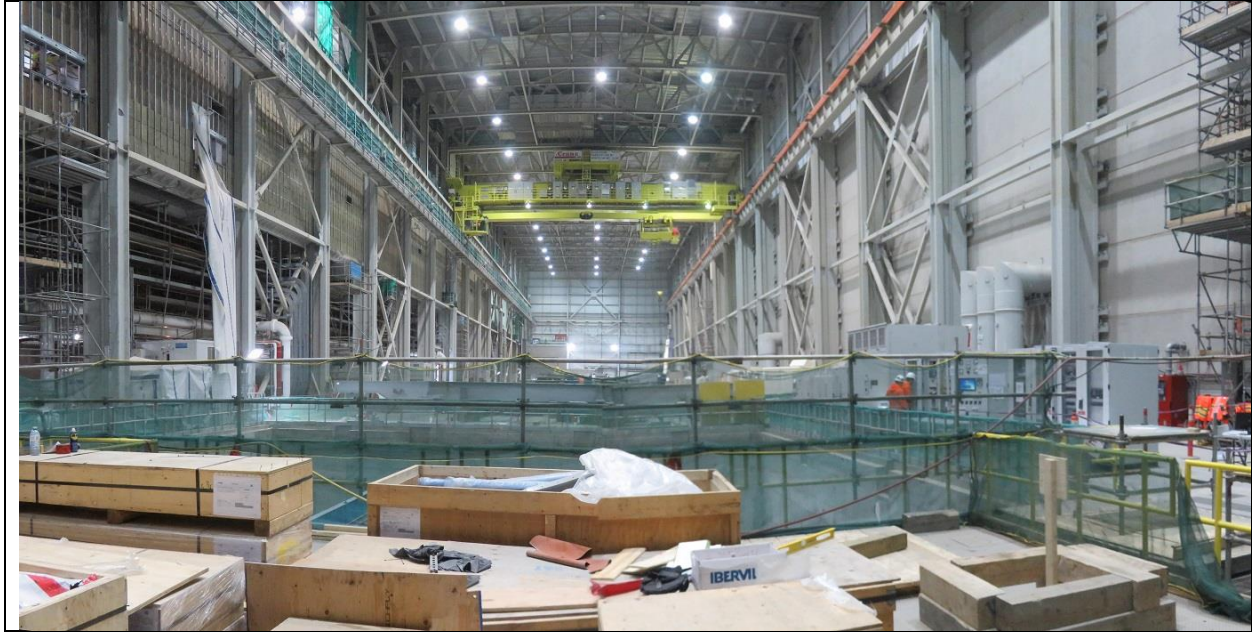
Powerhouse interior, looking north from service bay. Unit controls and switchboard cabinets are being installed along right side of turbine pits.
